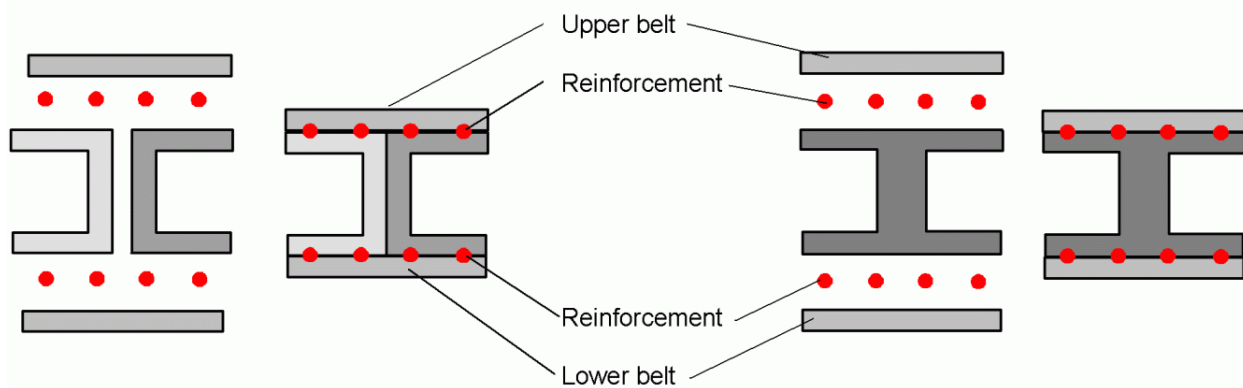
Initial and improved channel arrangement for seam weld position optimization.
